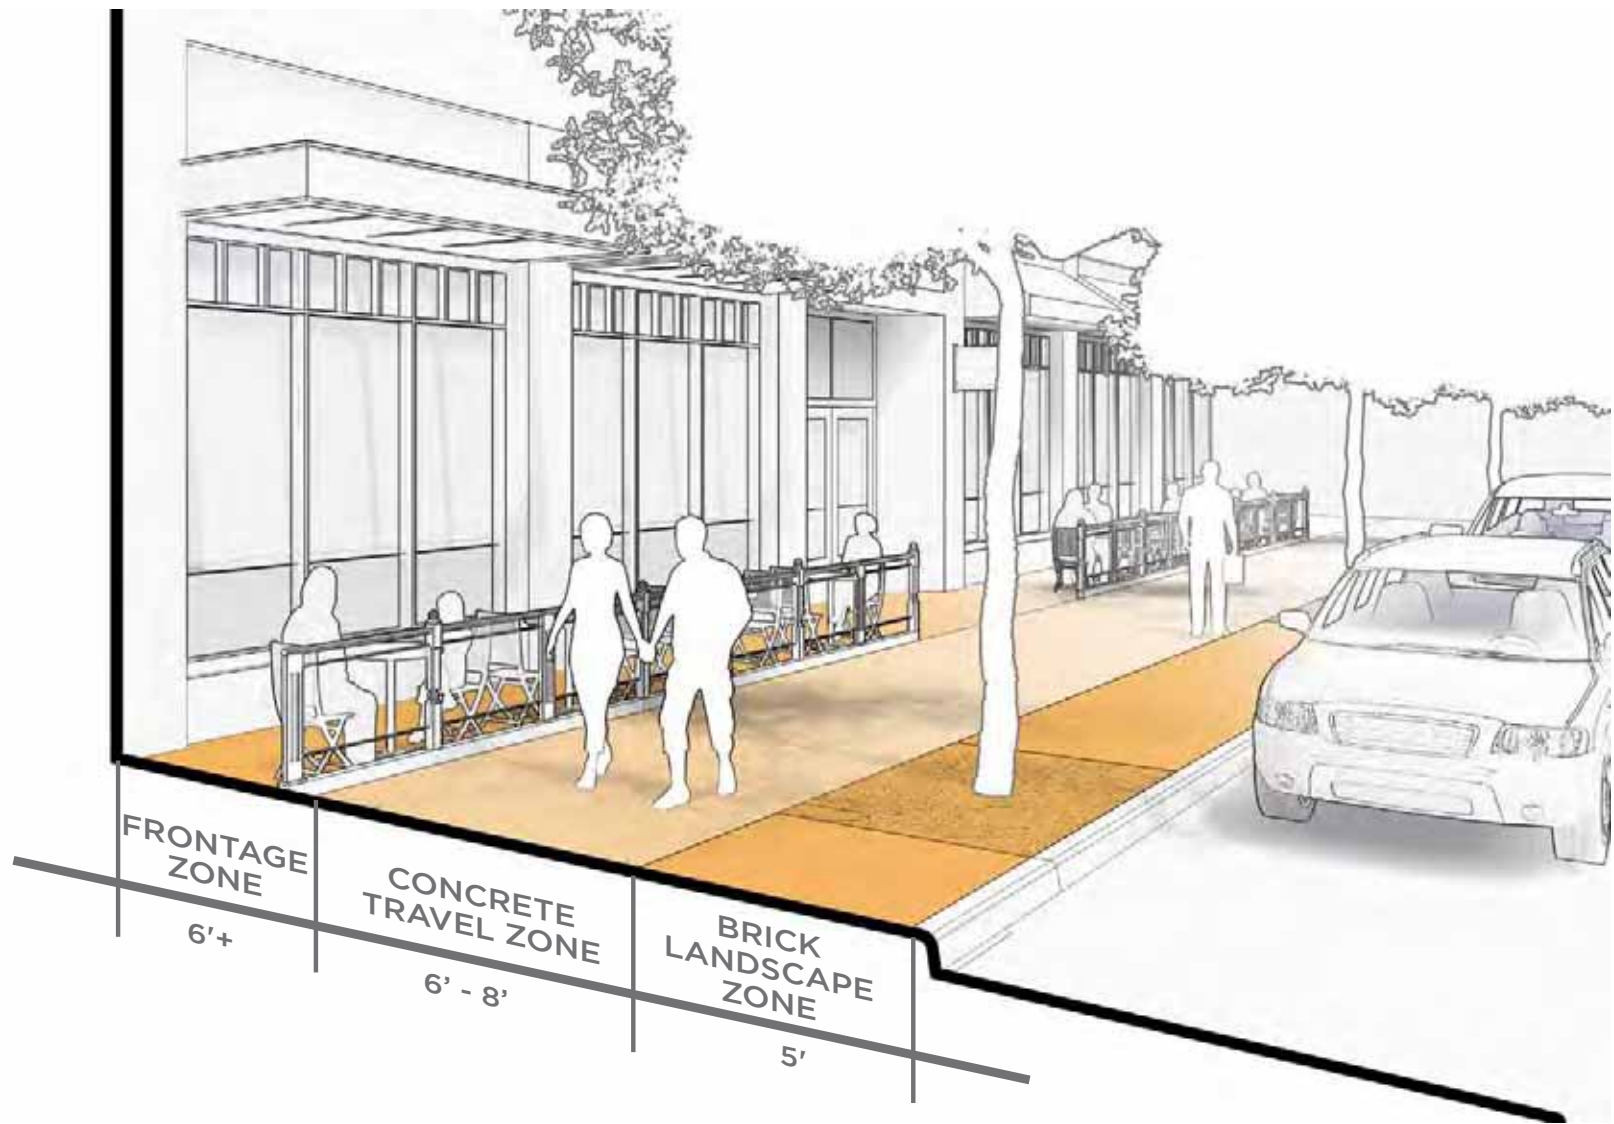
Proposed Corridor and Center Streetscape Typology Section
